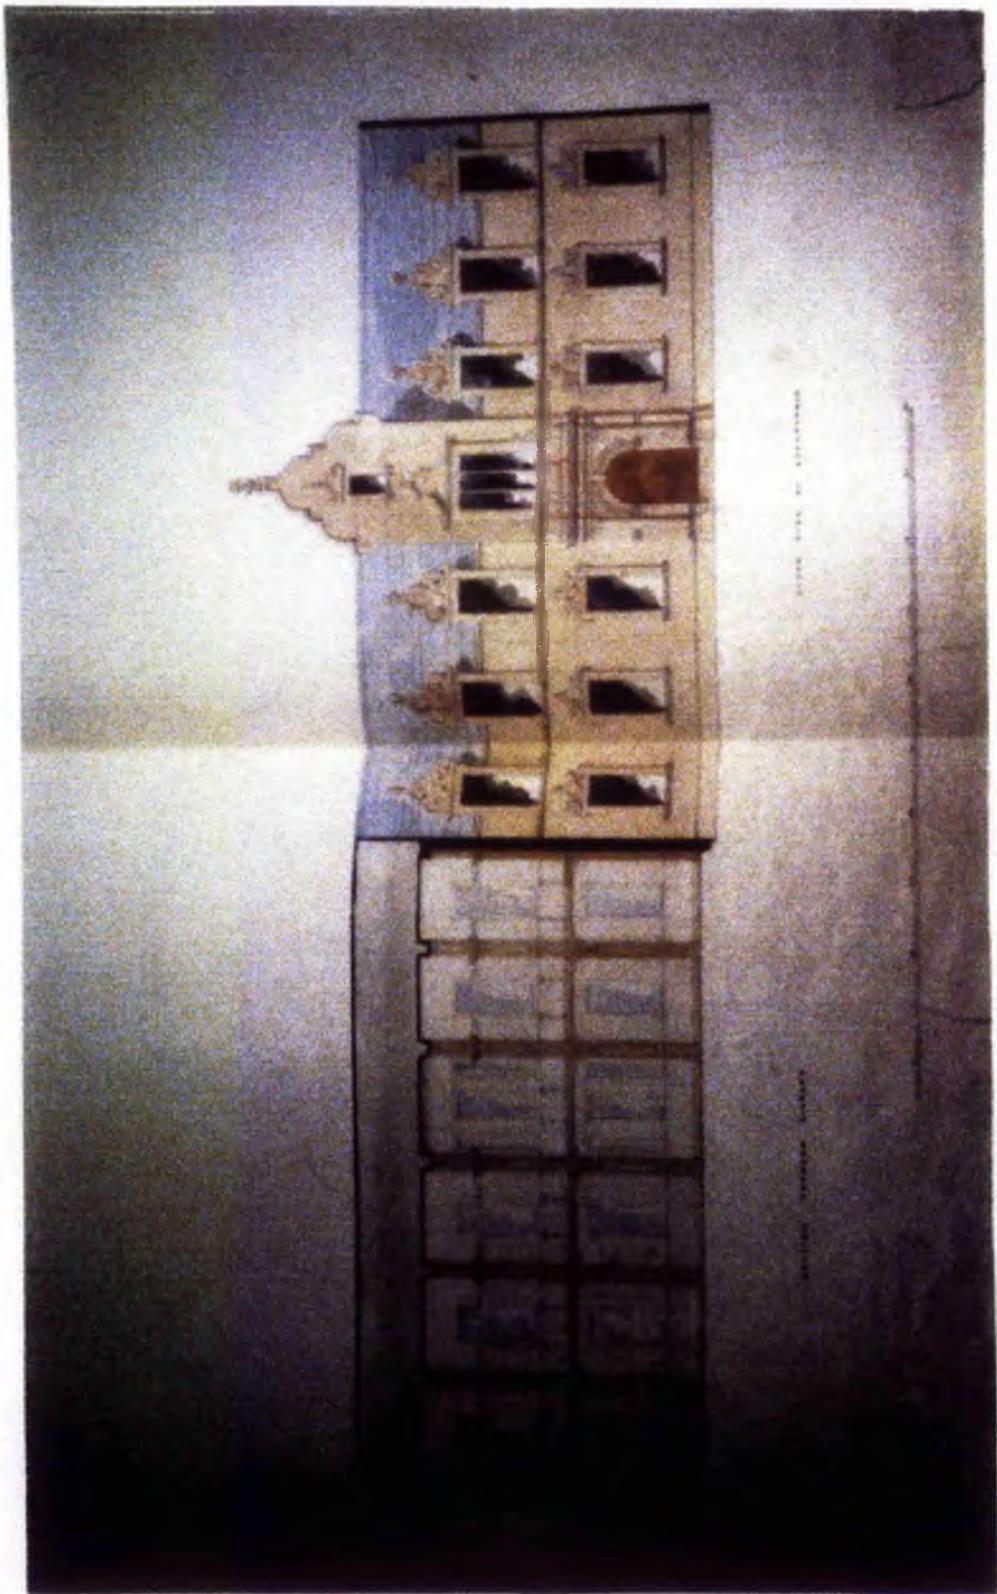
King's College. Neo Jacobean elevation of south side of quadrangle and section through Library. R. Matheson, 1855.
